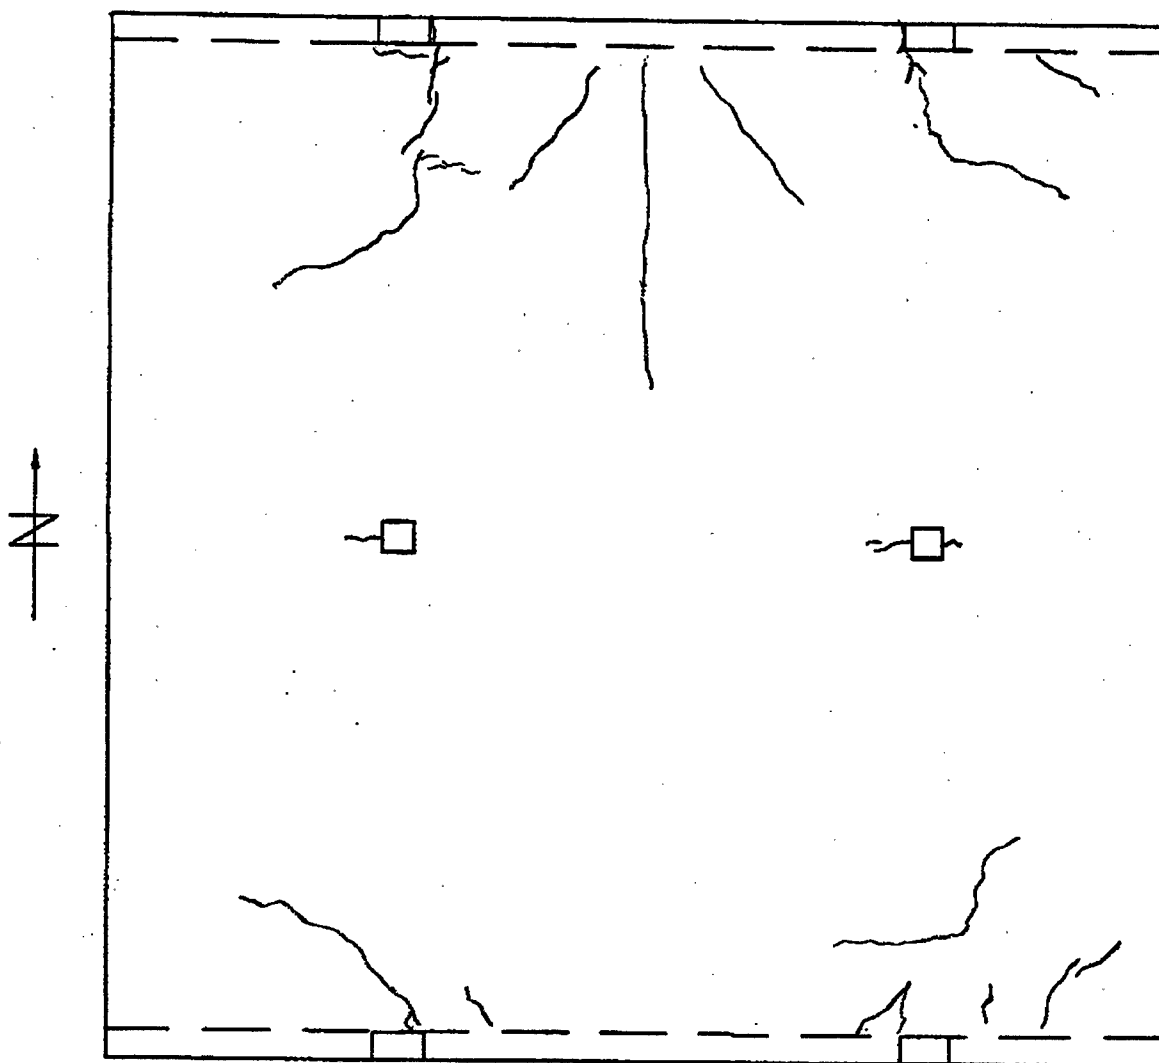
Crack Pattern, Third Floor Slab, Bottom Side, Pre-Test
